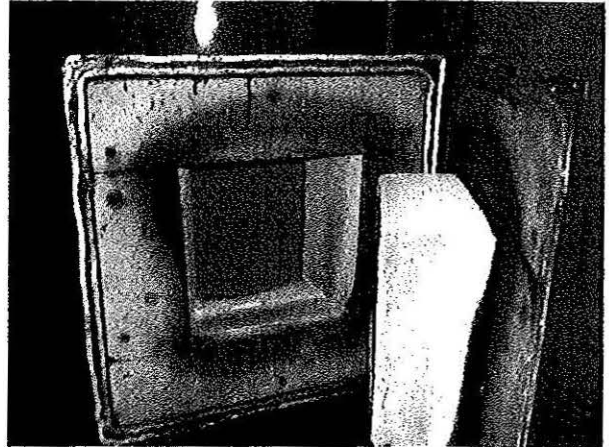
General view of Chimney for Incinerator No. 2. Photo taken at Plant Room, LG 1/F, Main Block.
